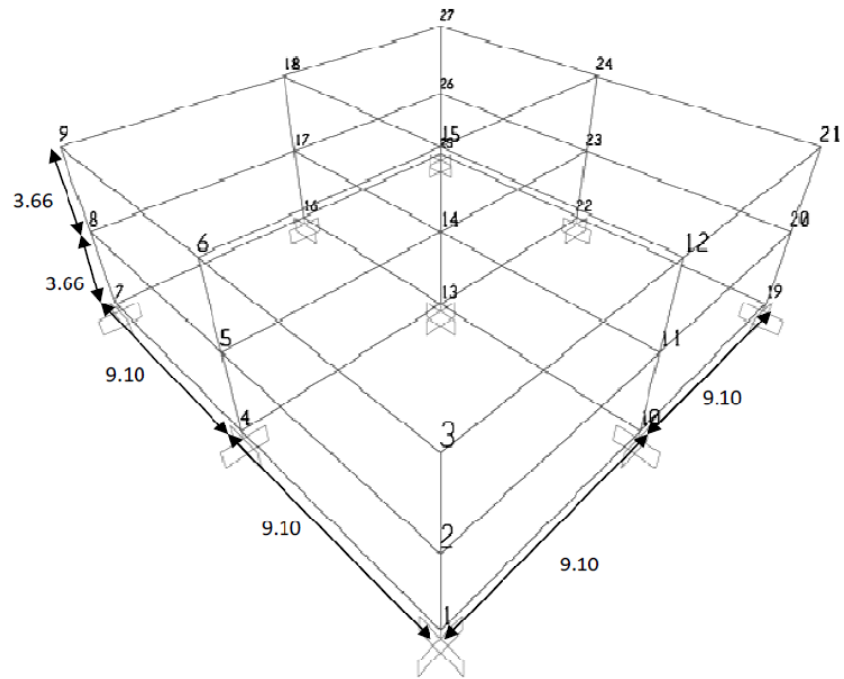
Structural model of fixed base Framed Structure (From SAP window)
